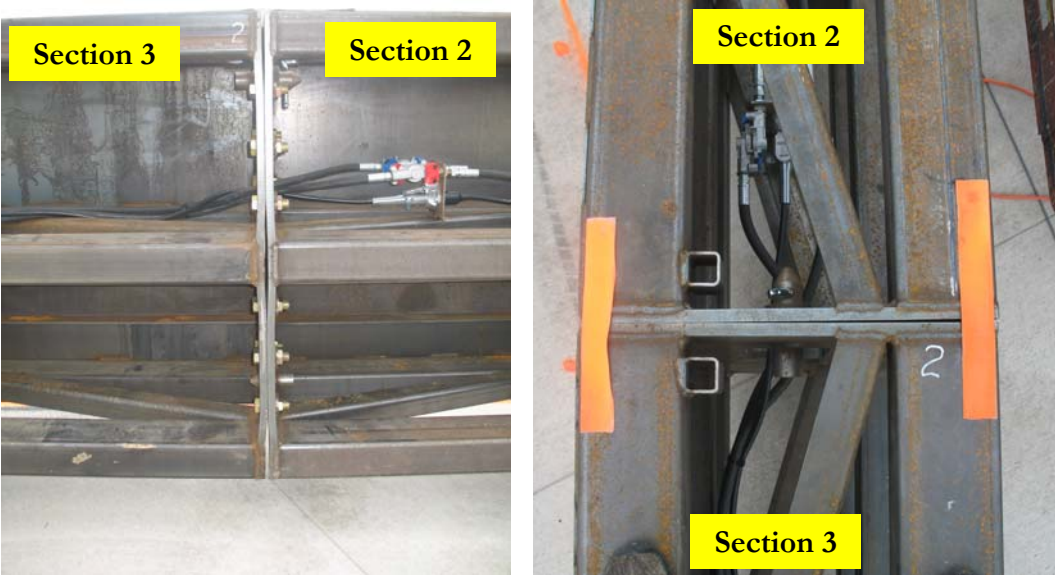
Post Impact Condition of Joint 2 (Connecting Sections 2 and 3)
